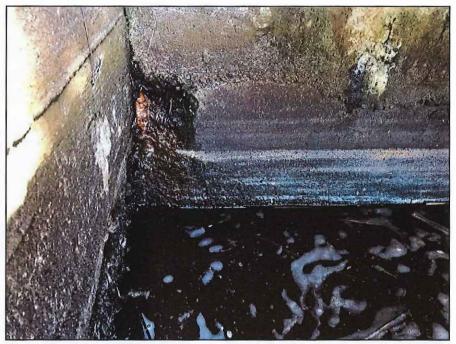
Spalling with seepage at the interior right corner of the downstream left wall of the primary spillway discharge structure.
